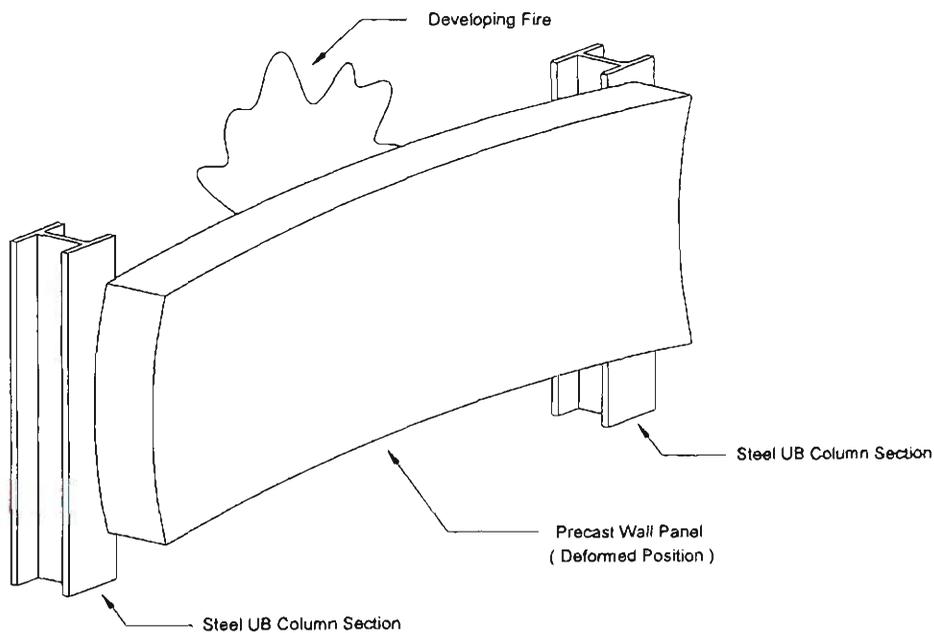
Typical Horizontal Wall Panel Orientation and Deformation Characteristics
